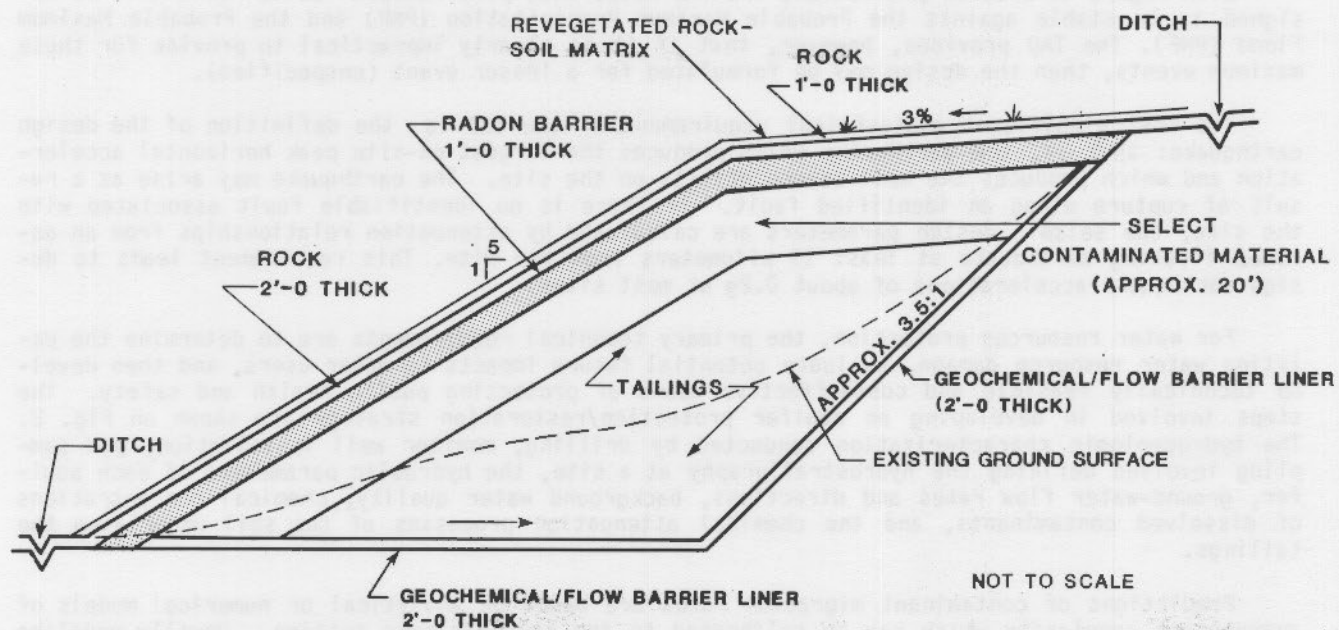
Collins Ranch Disposal Site Typical Cross Section
